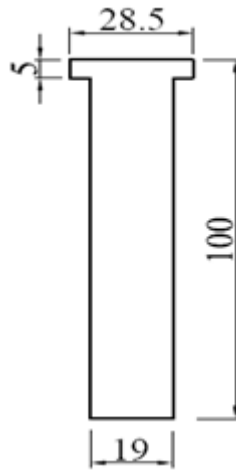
Elevation of Headed Stud (All dimensions are in mm)
